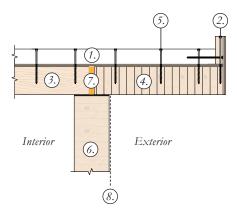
Wood Outrigger Supports for NLT Overhang
